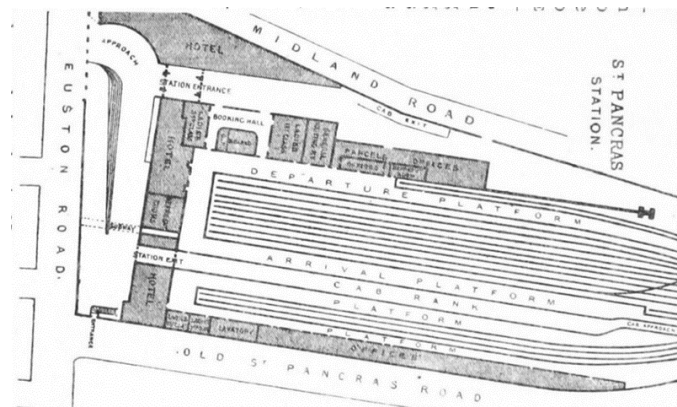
The head house plan type of St Pancras Station with its U-shaped plan created better accessibility.
